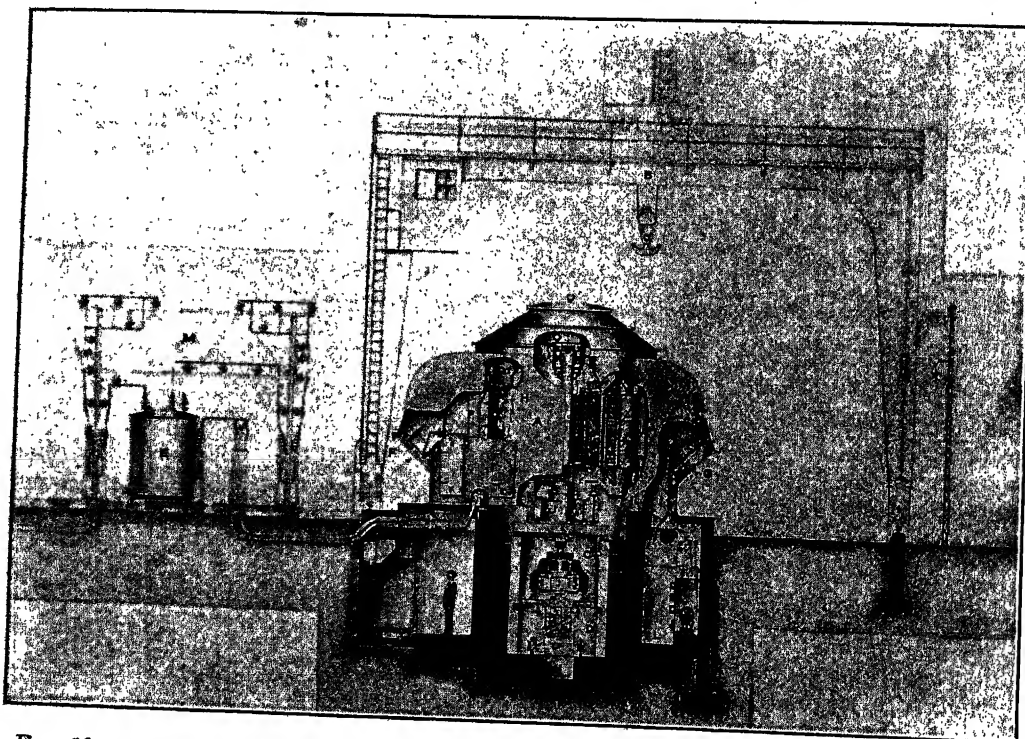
25,000-Kv-a. SYNCHRONOUS CONDENSER. TORONTO-LEASIDE TRANSFORMER STATION
